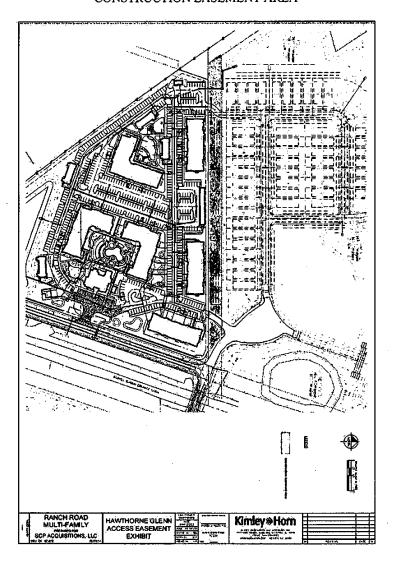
CONSTRUCTION EASEMENT AREA
